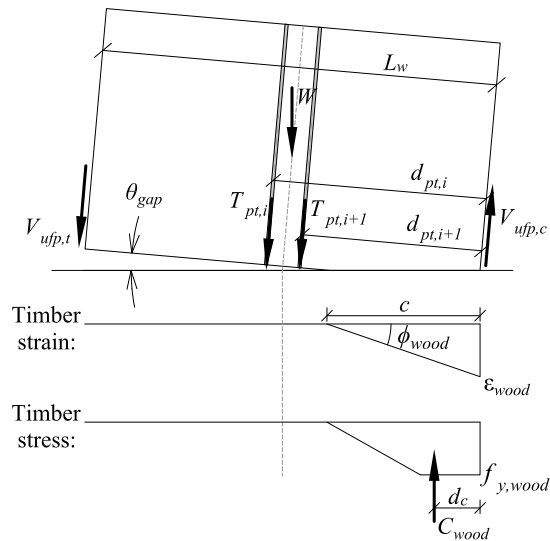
Forces distributed at the base of post-tensioned rocking timber walls UFPs connecting the wall to boundary columns
